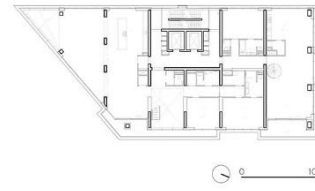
20th Floor Plan of Haut (Url-1, 2024).
